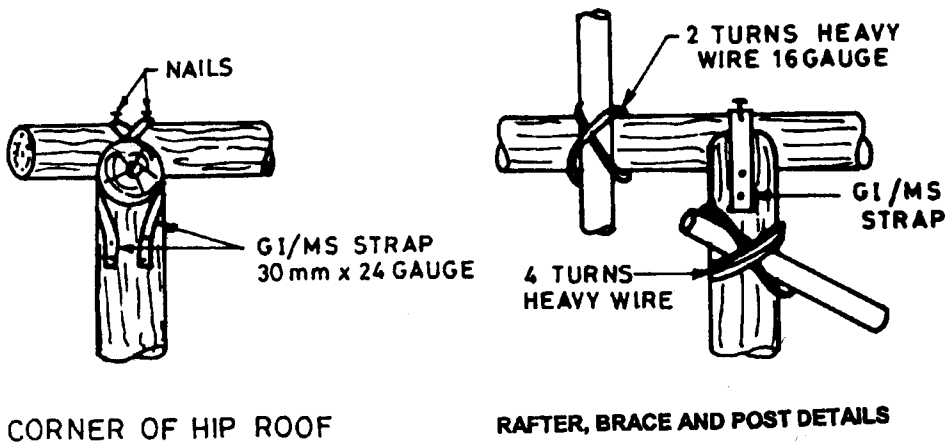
CONNECTIONS USING WIRES AND STRAPS IN THATCHED BUILDINGS
